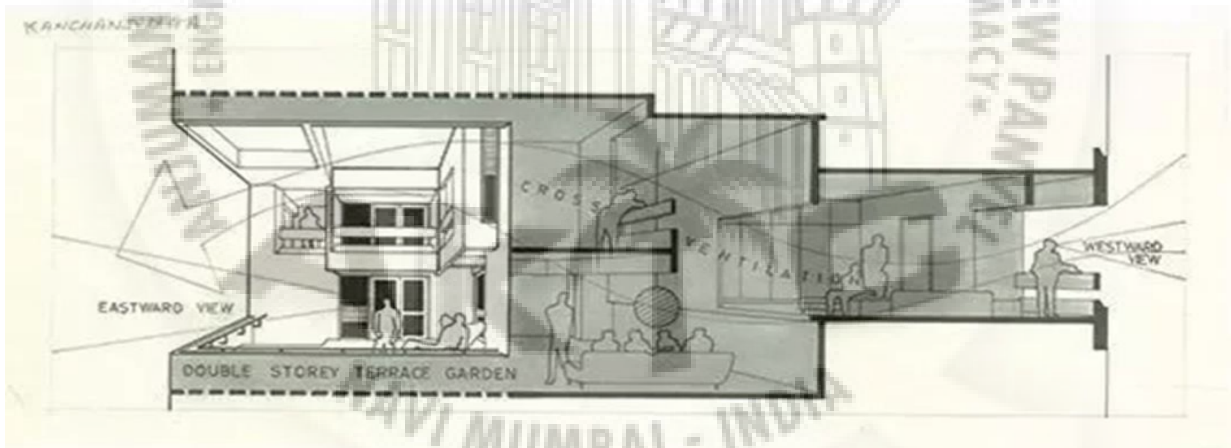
Kanchenjunga Apartment flat section (Source- architectopedia)
